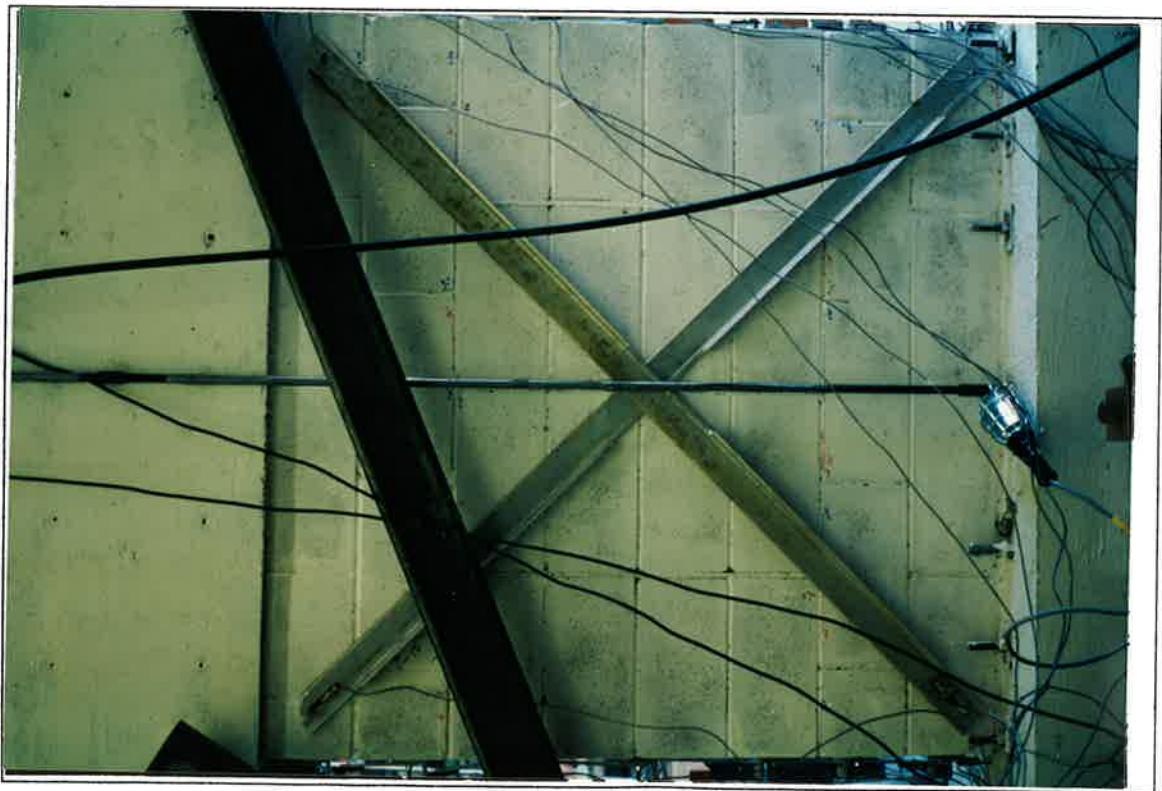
Slitted Wall North Face At 133 kN (30 Kips) Lateral Load
